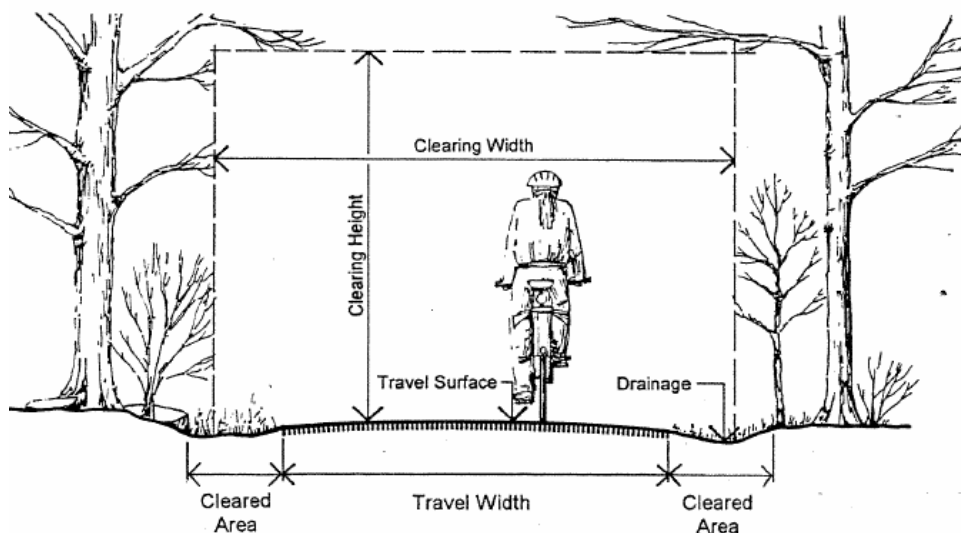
Cross-Section of a Typical Multi-Use Trail
